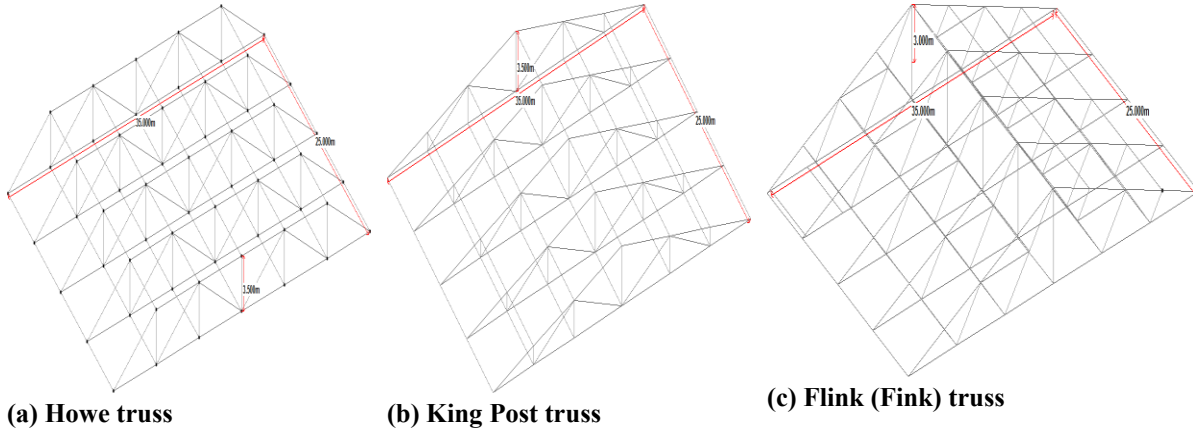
Truss geometries modelled in STAAD.Pro for the 35 m × 25 m plan
